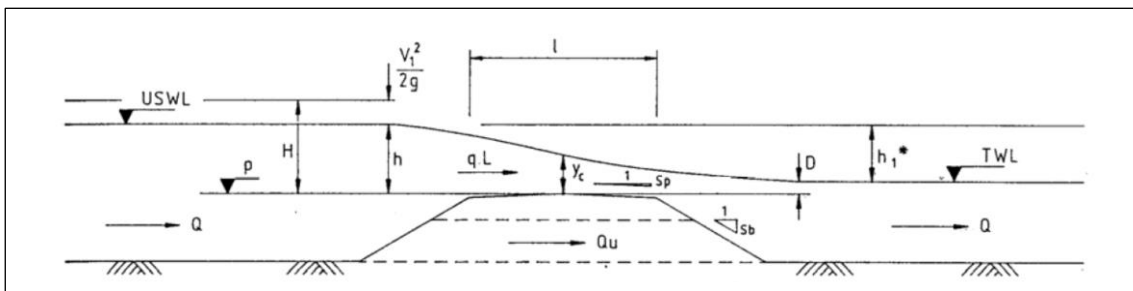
FLOODWAY NOMENCLATURE [16]
